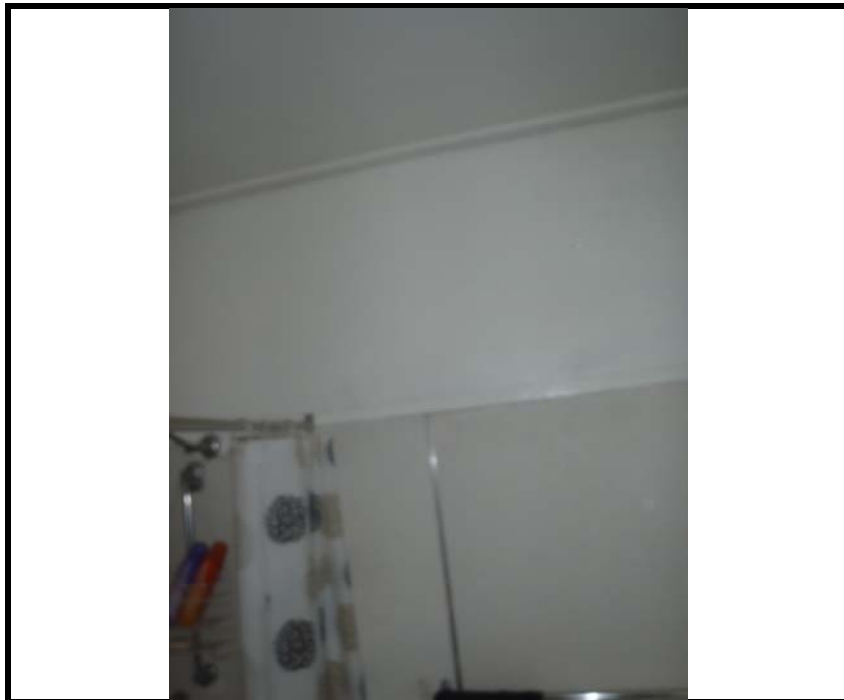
ACM sheeting used in the walls and ceiling to the bathroom, including the patterned section to the lower 1.8m, at 1 McLeod Road.
